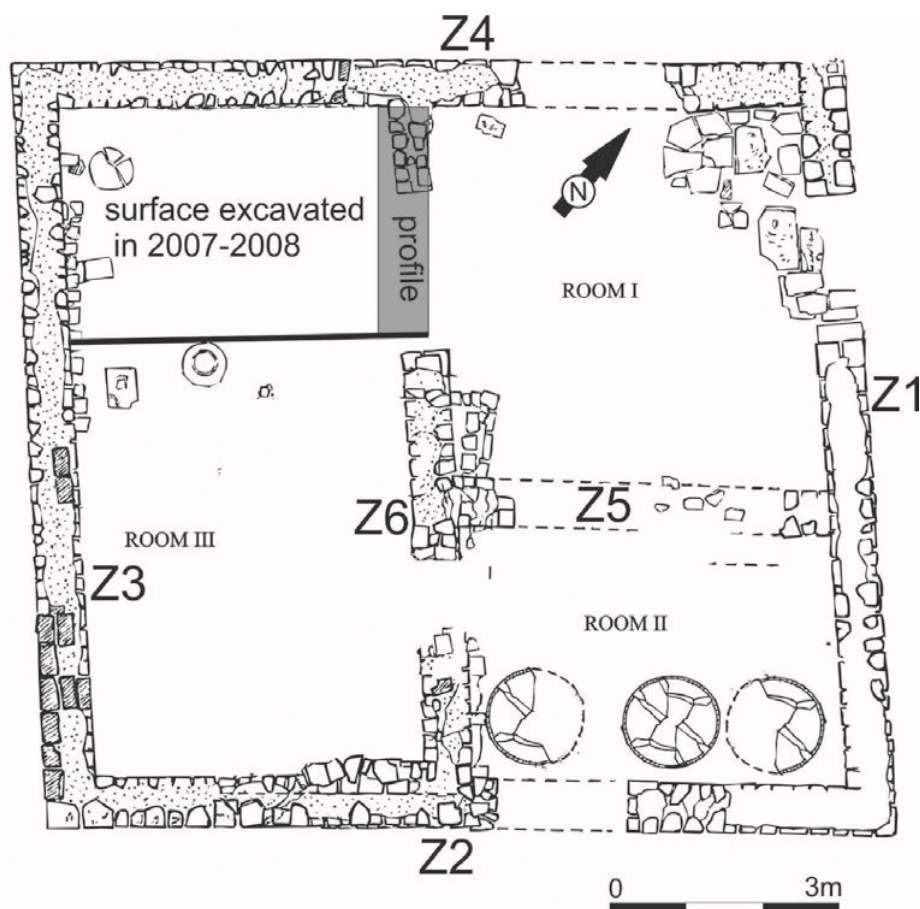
Plan of building C1 with location of samples (orange/light brown strip).
